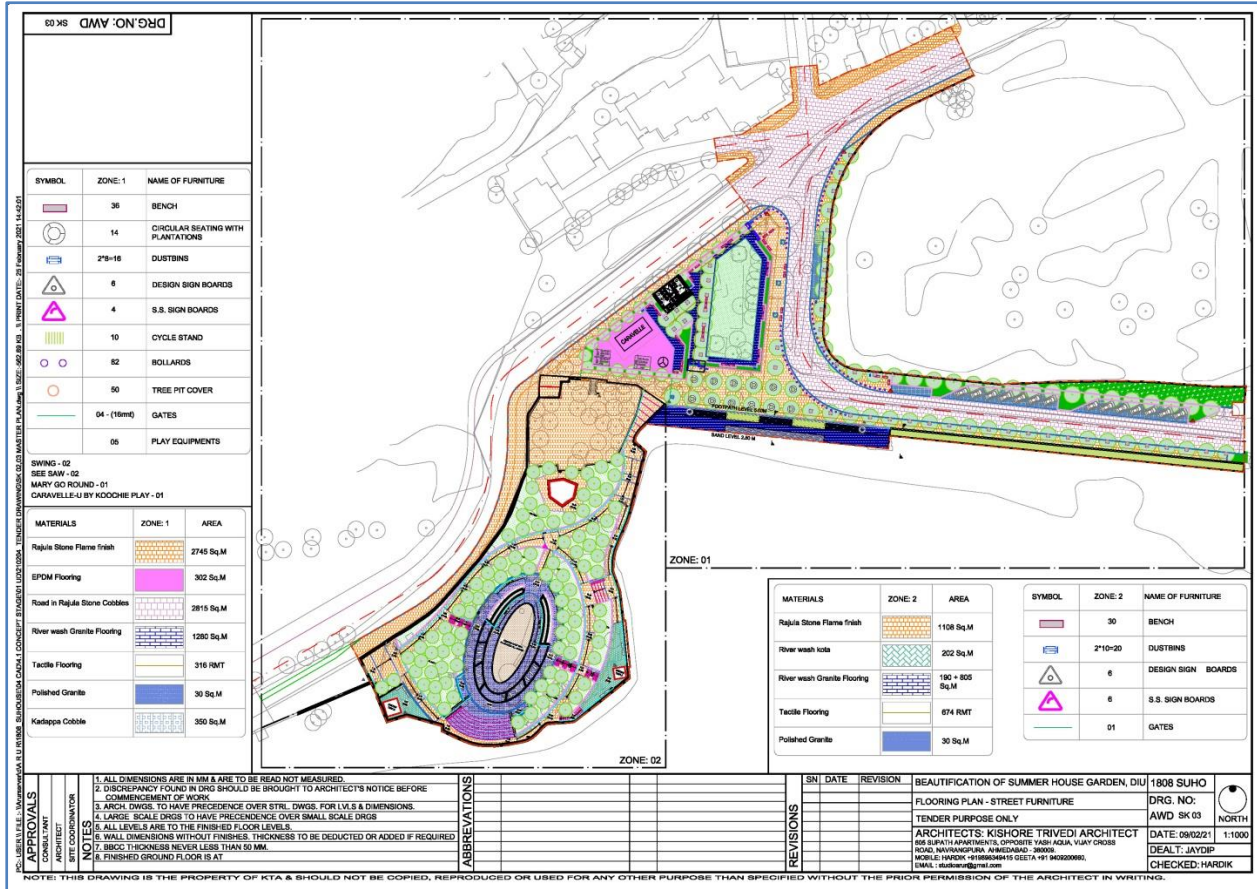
Proposed View of Summer House Garden (Stretch 2)
